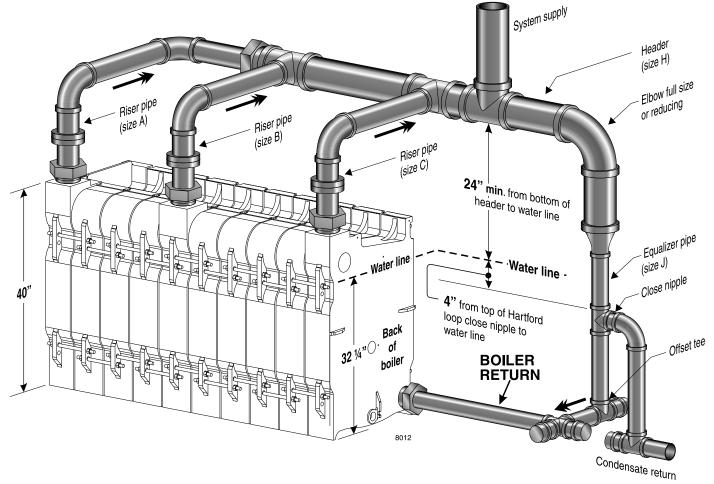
Model 680 through 980 steam boiler piping — NOTE minimum 24 inches between boiler water line and bottom of header.
